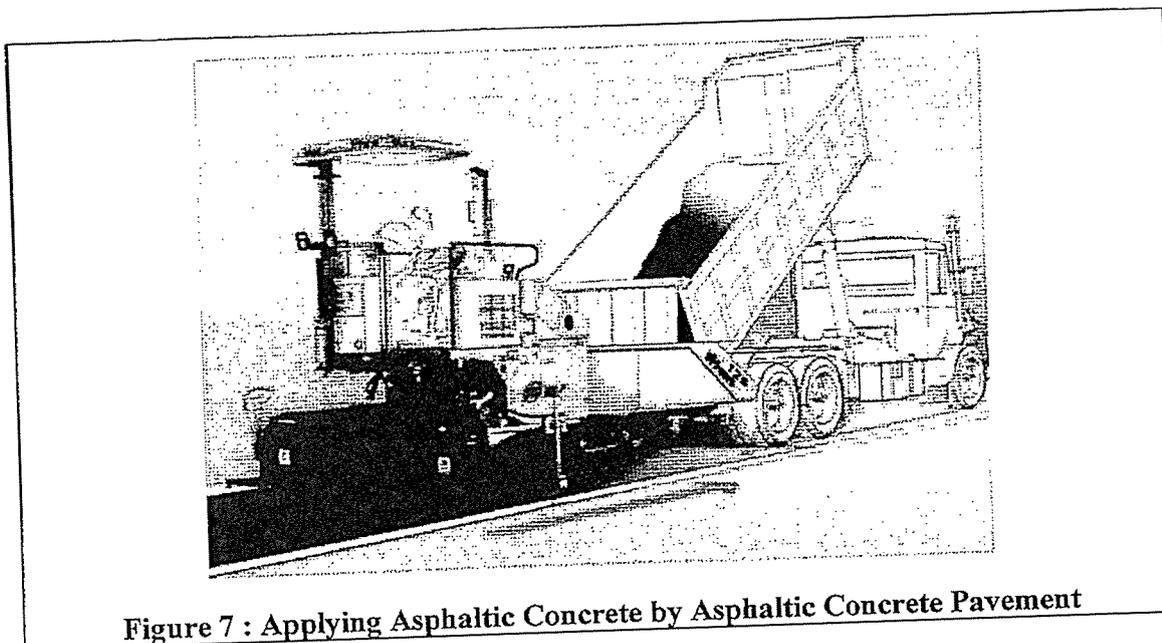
Applying Asphaltic Concrete by Asphaltic Concrete Pavement
